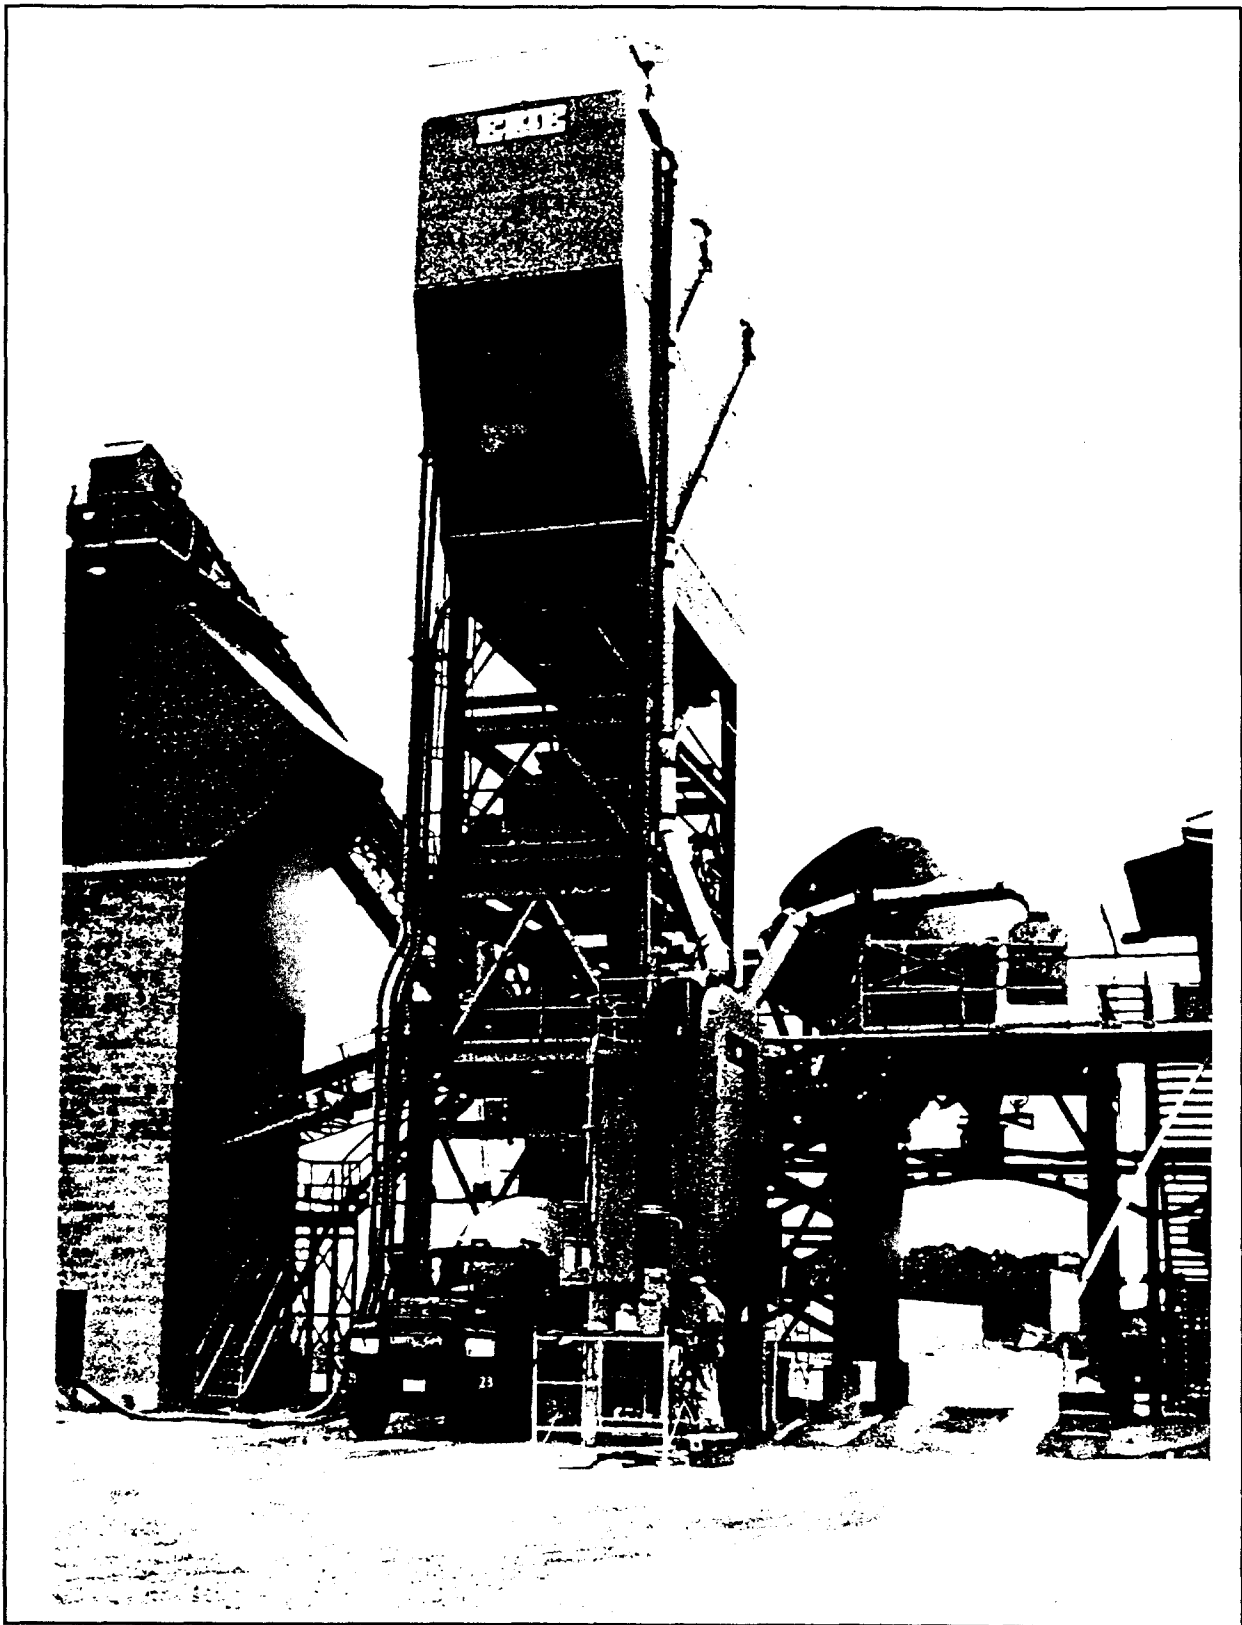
Detail of Dry Batch and Central Mix Alleys from Exit
